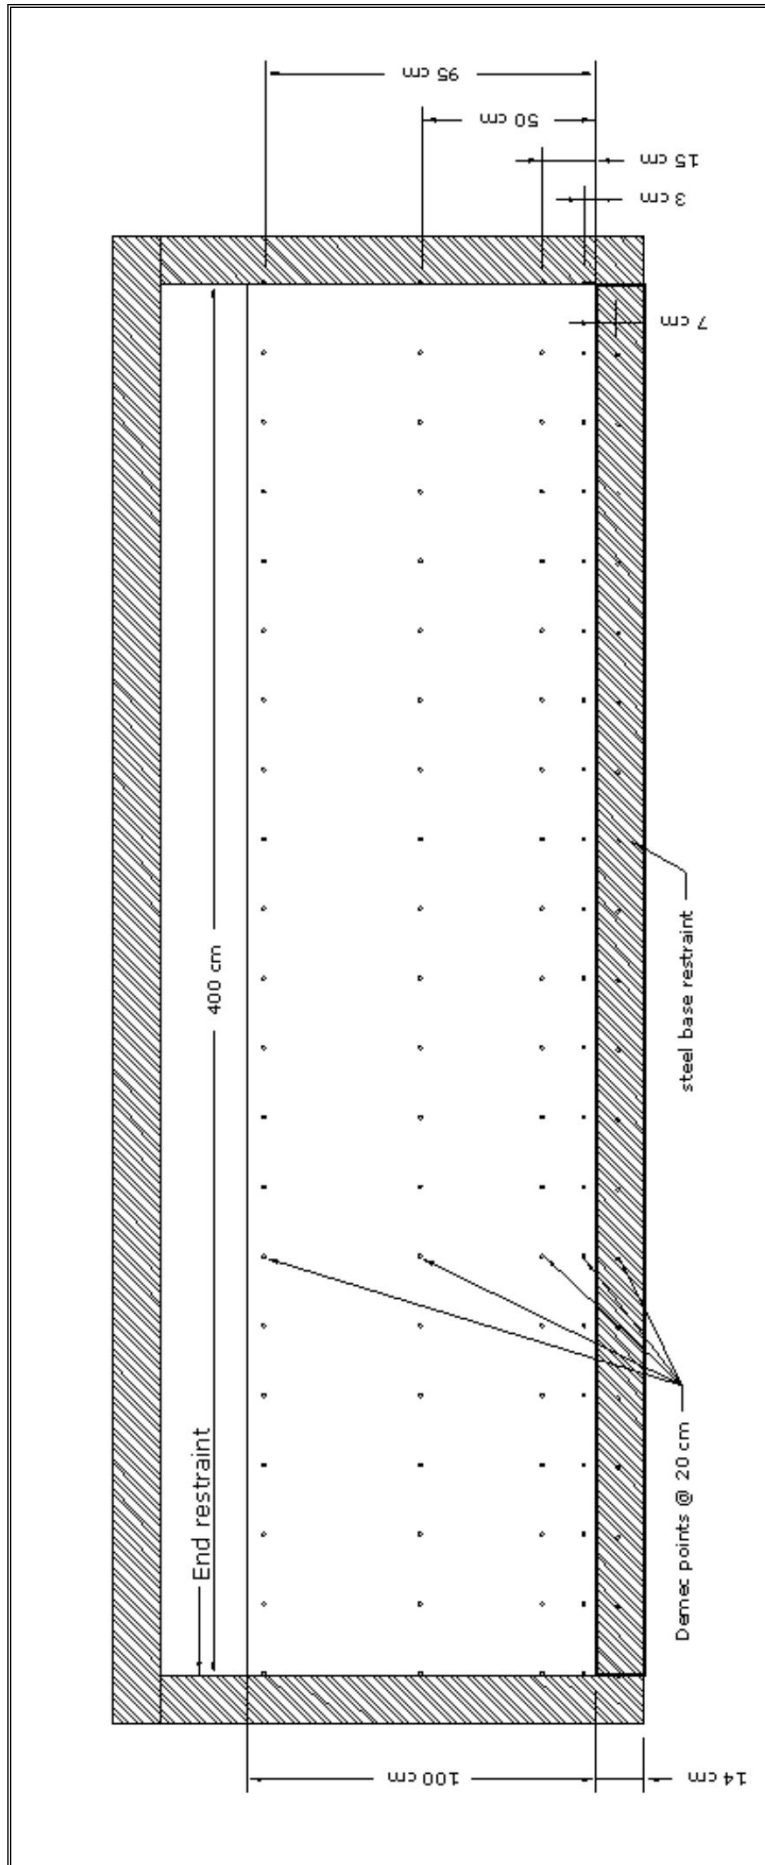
Fixing of demecs on wall (4w) and (4S)
